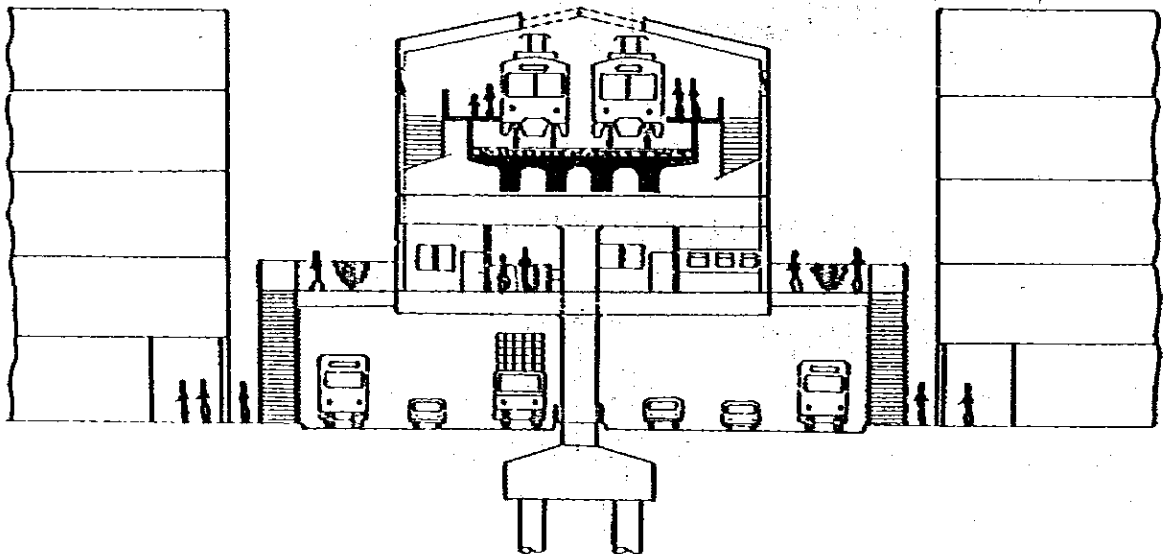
TYPICAL CROSS SECTION (Urban railway)
